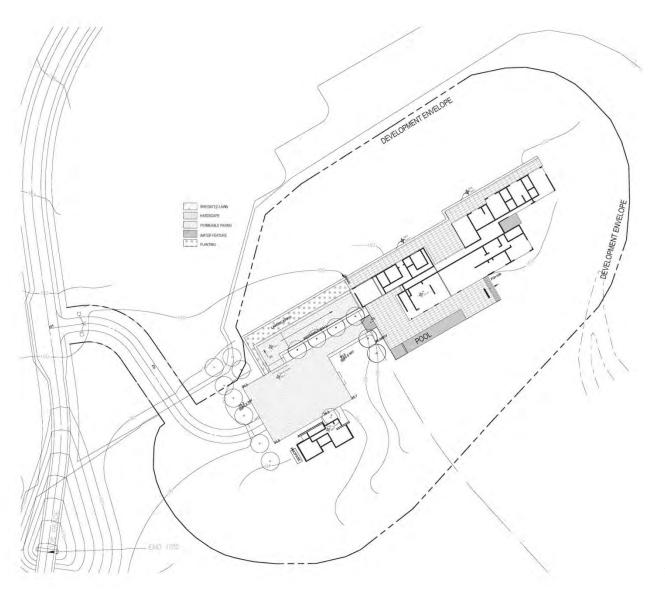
A-4-STB-14-0010 Inland Estate Site Plan
